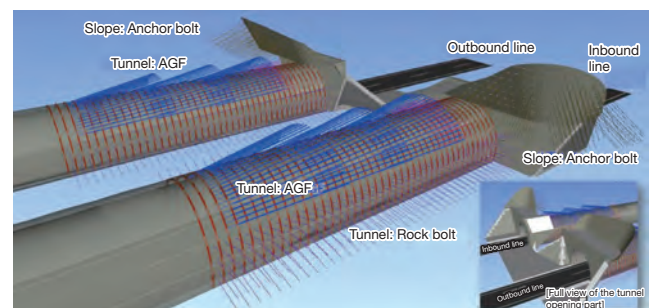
Three-dimensional model of slope countermeasures and tunnel auxiliary construction method (showing the inside of the ground)
